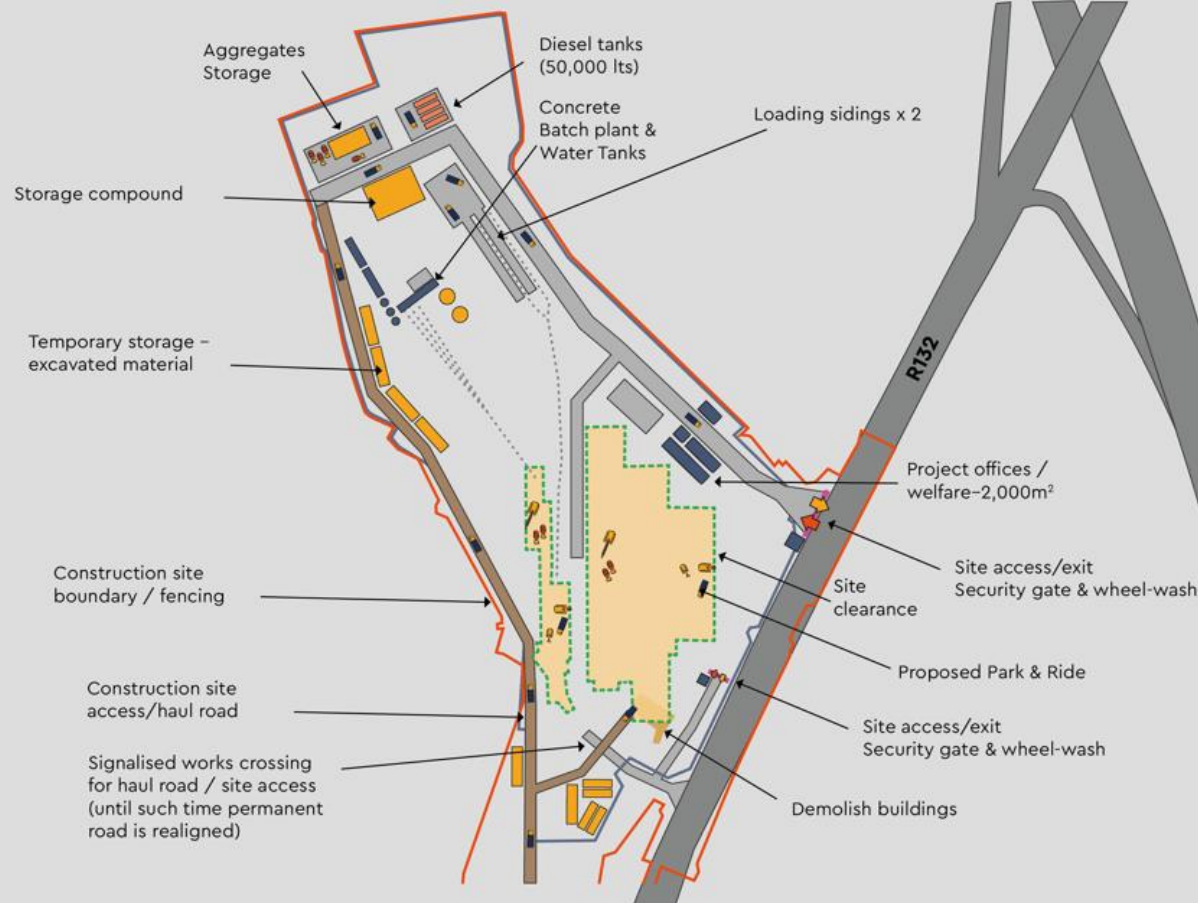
Estuary Station - Stage 2 - Piling, Traffic Management and Park and Ride Works
